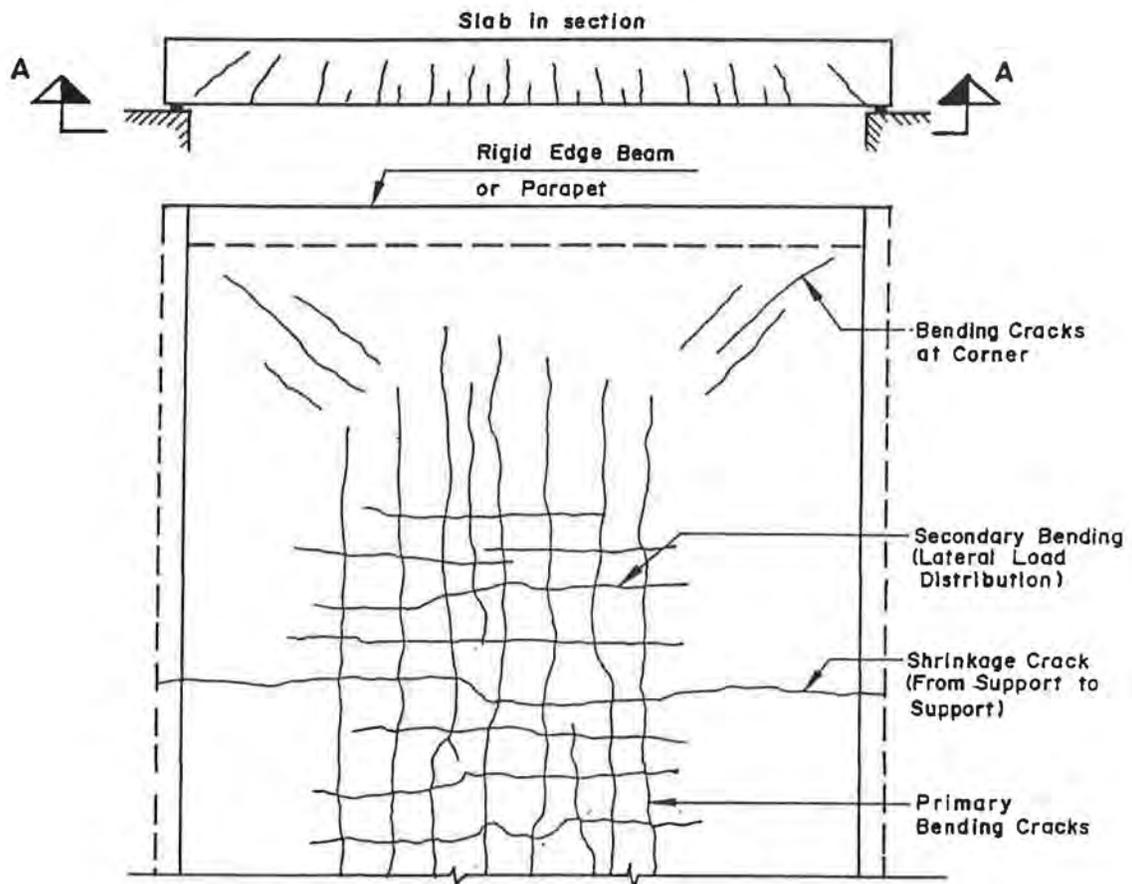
Underside of Slab Bridge Deck (Ref. Unknown)
